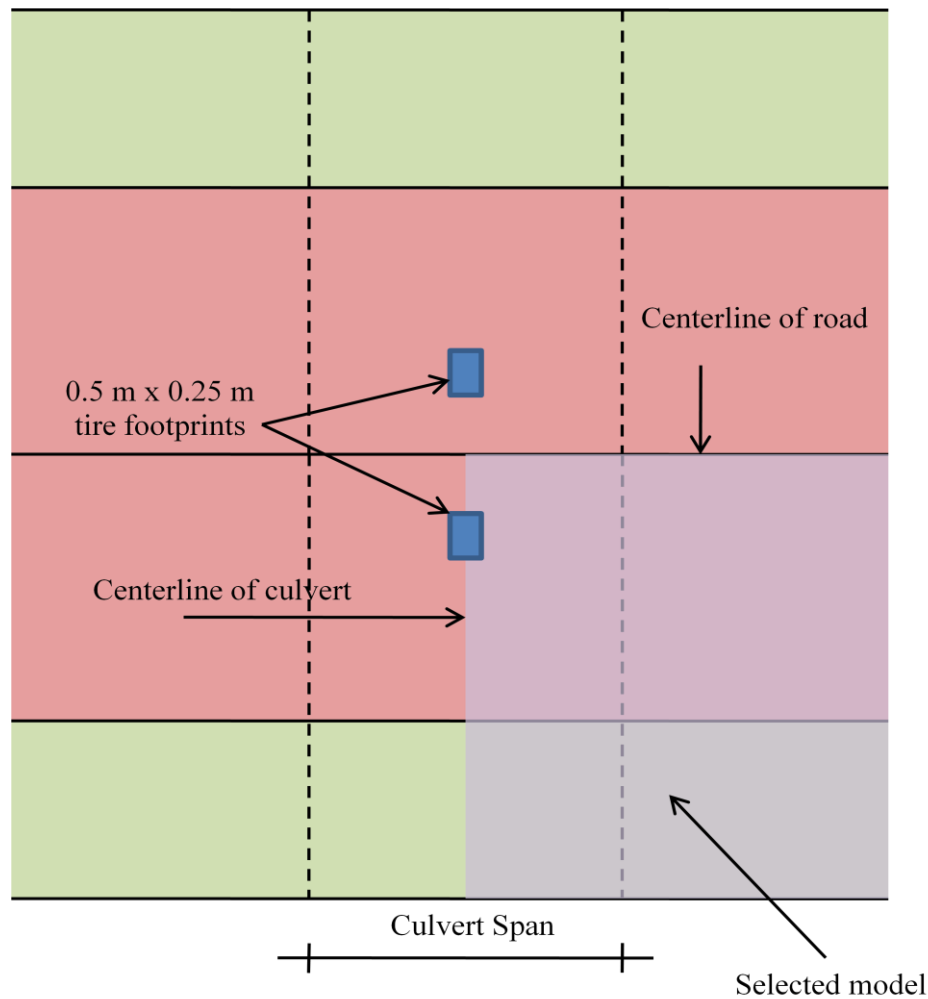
typical numerical model for the culvert under a rigid pavement
